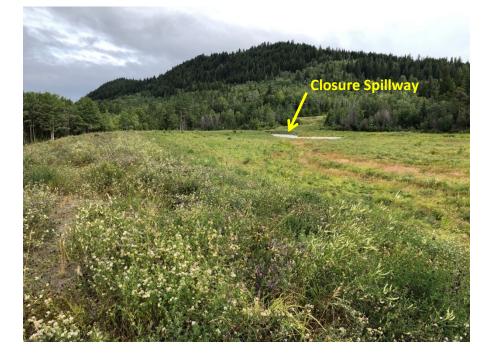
Tailings Dam – Southwest leg, looking southeast along downstream slope.
